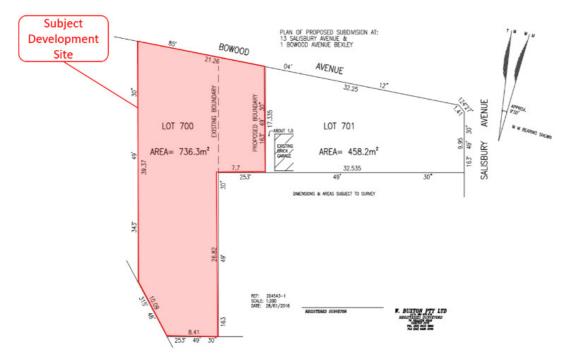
Extract of Proposed Subdivision Plan, illustrating development site in red shading. source: Proposed Plan of Subdivision prepared by W. Buxton Pty Ltd, as adapted by CPS
